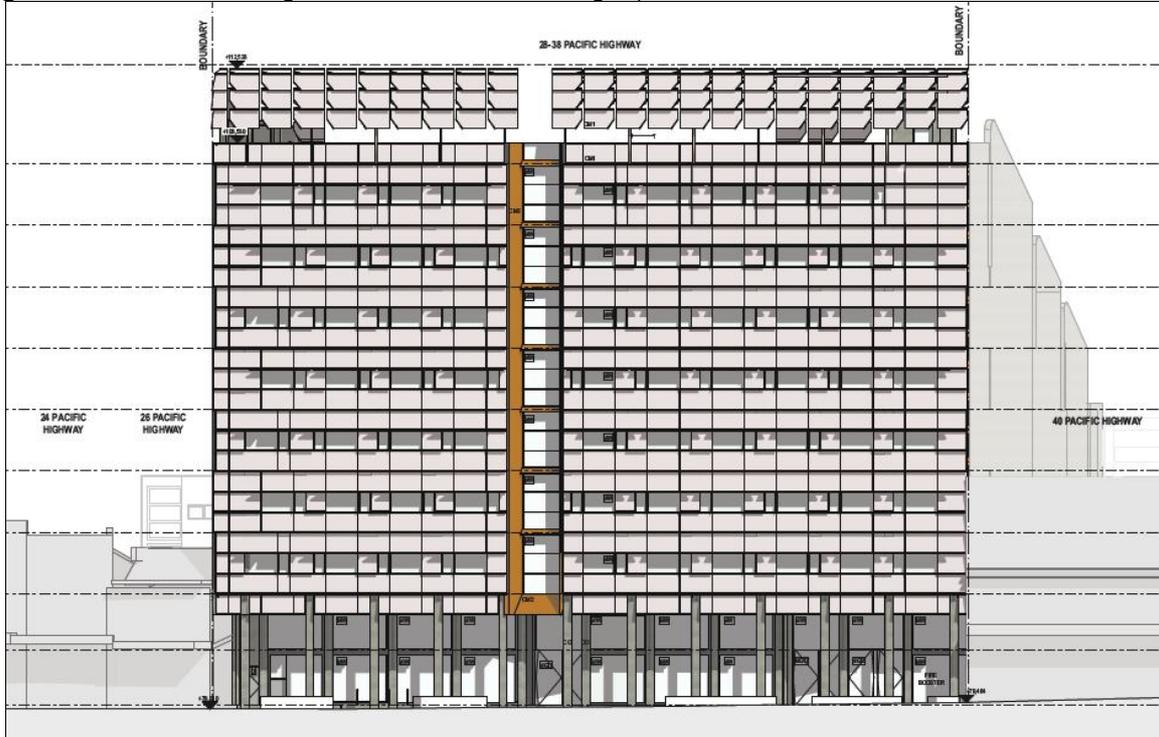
Pacific Highway (north) elevation (Source: Tonkin Zulaikha Greer architects).
